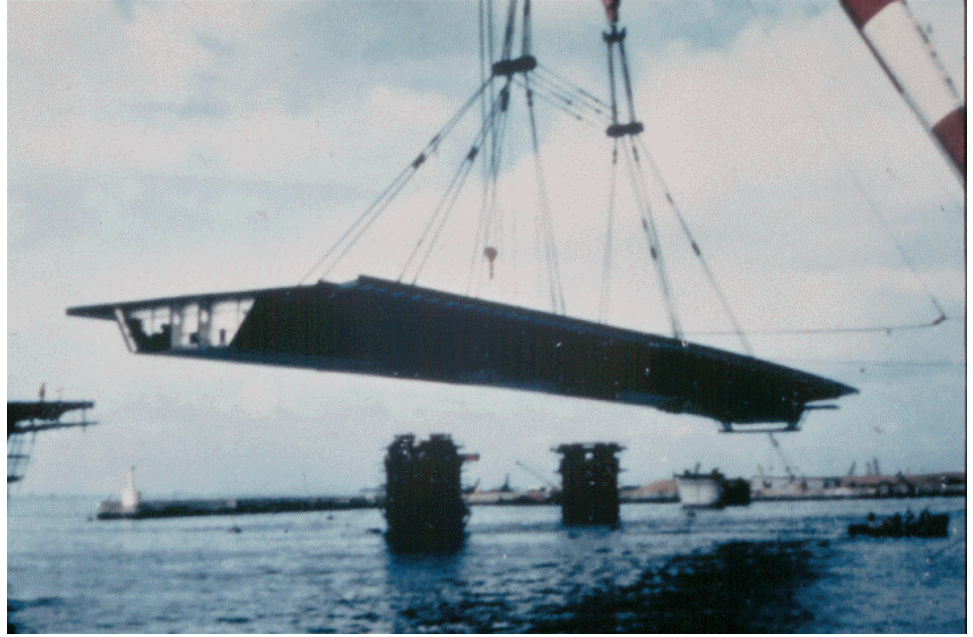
Span-by-span Total Span Erection (Lifting)
